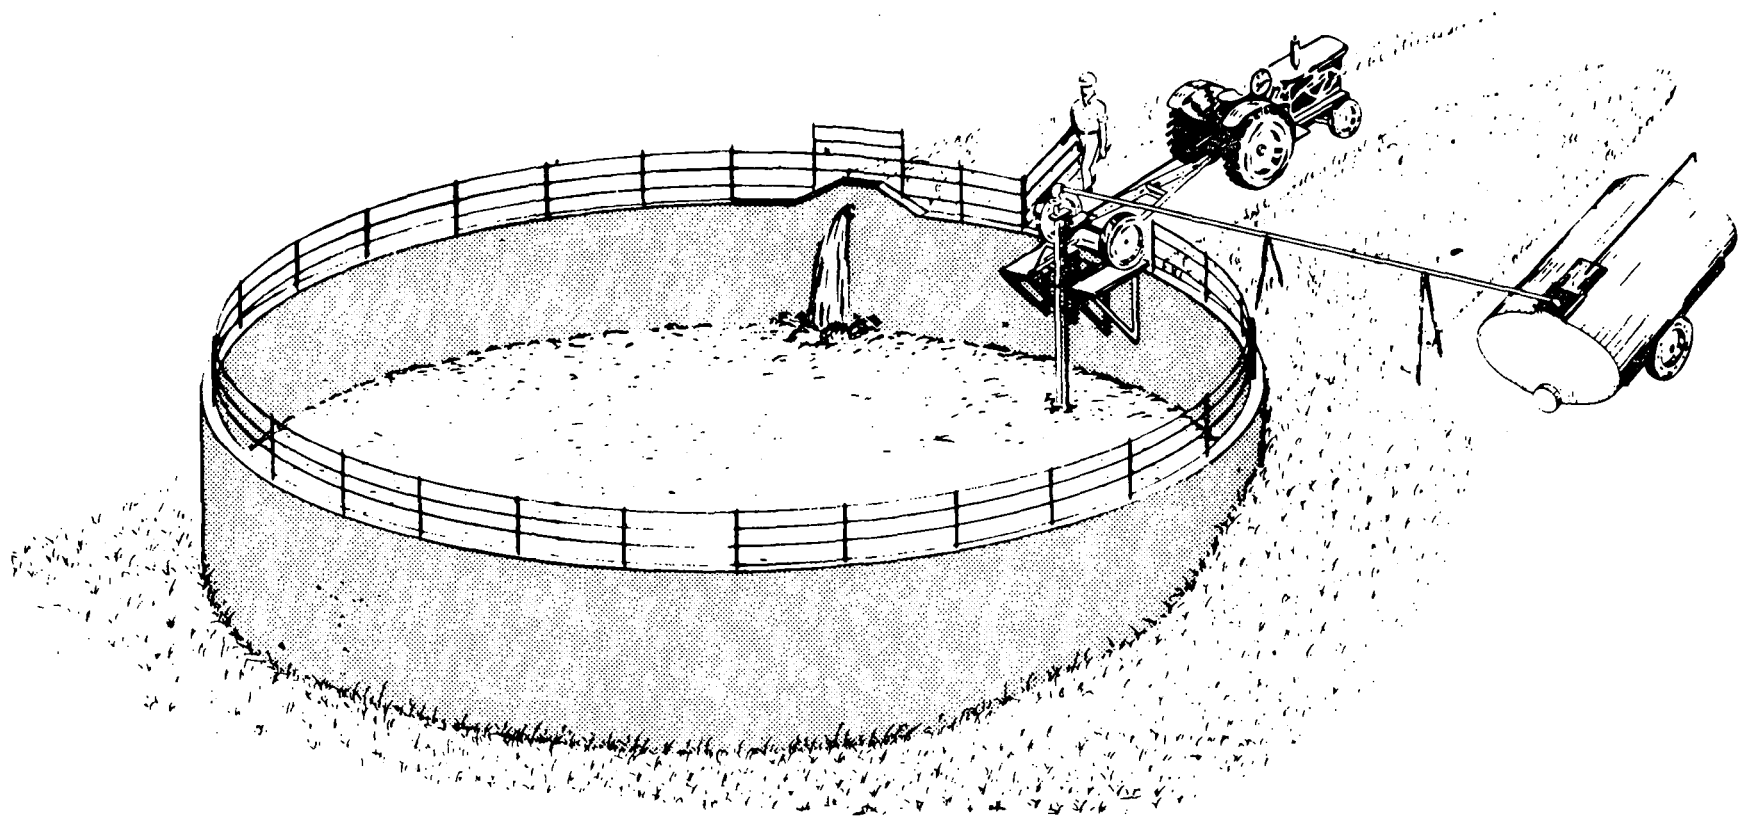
Below-ground Open Circular Manure Tank (CPS Plan 3250)
